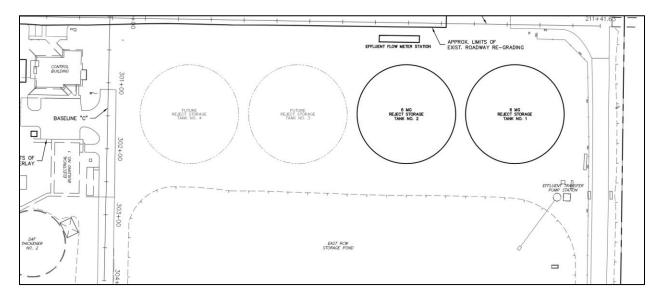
Portion of Proposed Site Plan from 2010 NWRF Expansion (That was not constructed)
